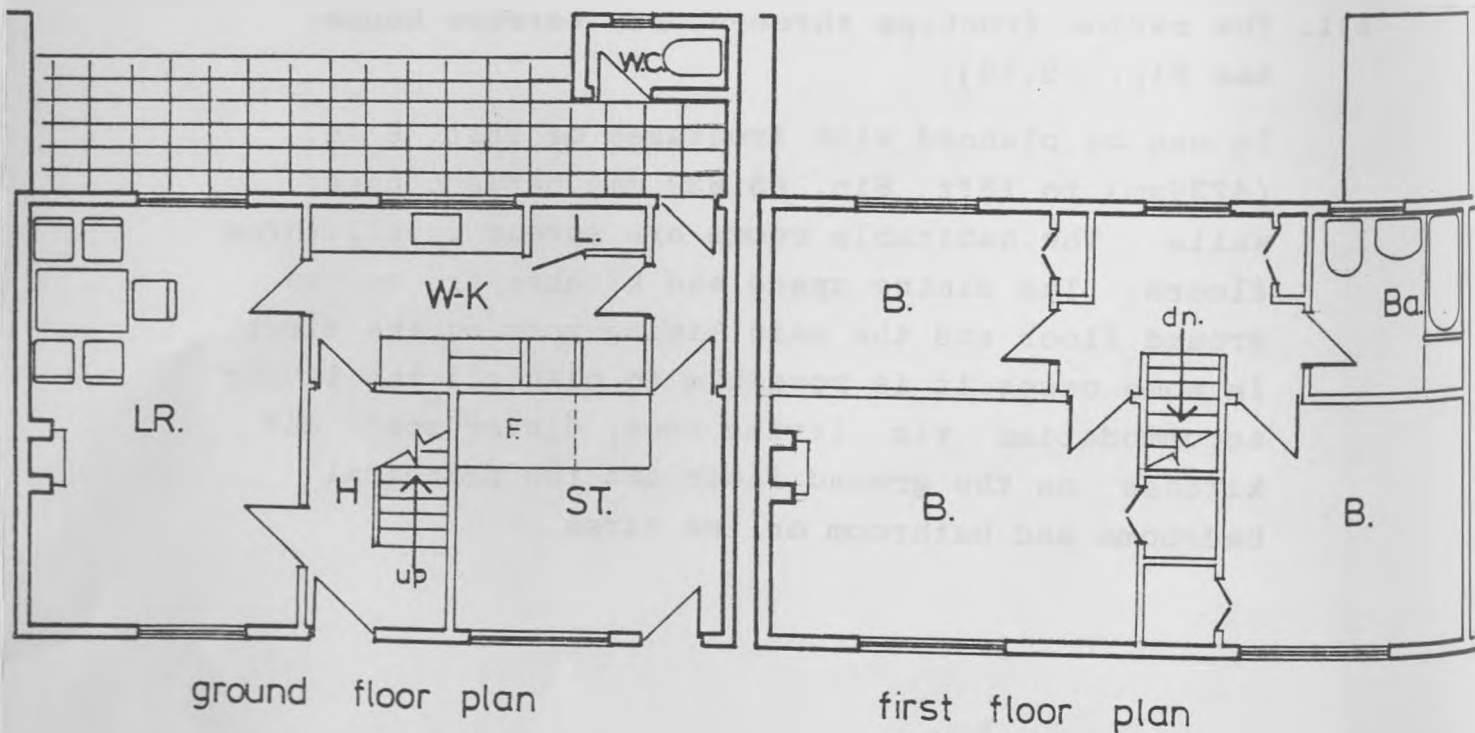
WIDE FRONTAGE TERRACE HOUSE 1:100
